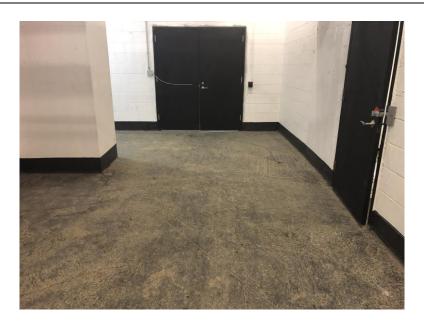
View of the concrete floor in the sub-cellar of the East Tower. Dated 12/20/2018.
